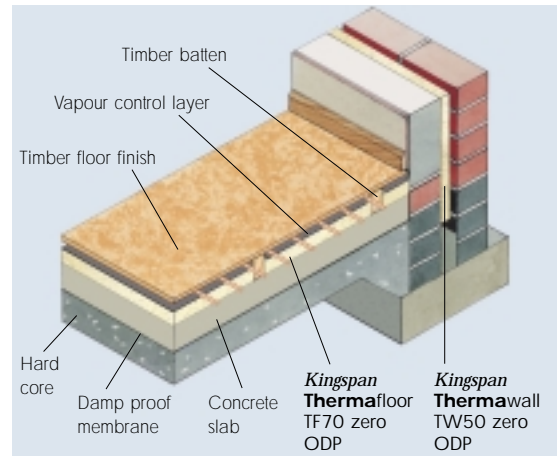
UNDERFLOOR HEATING - TIMBER FLOOR ON BATTENS
